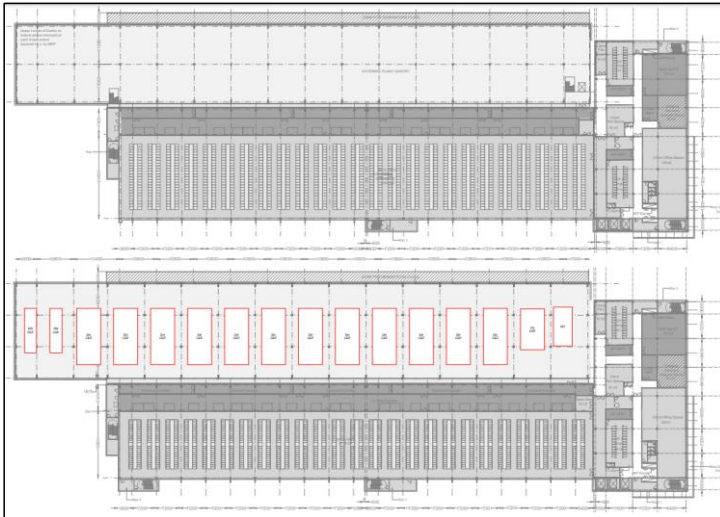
Third Floor Gantry Layout (Chiller Layout) – Buildings A & B
